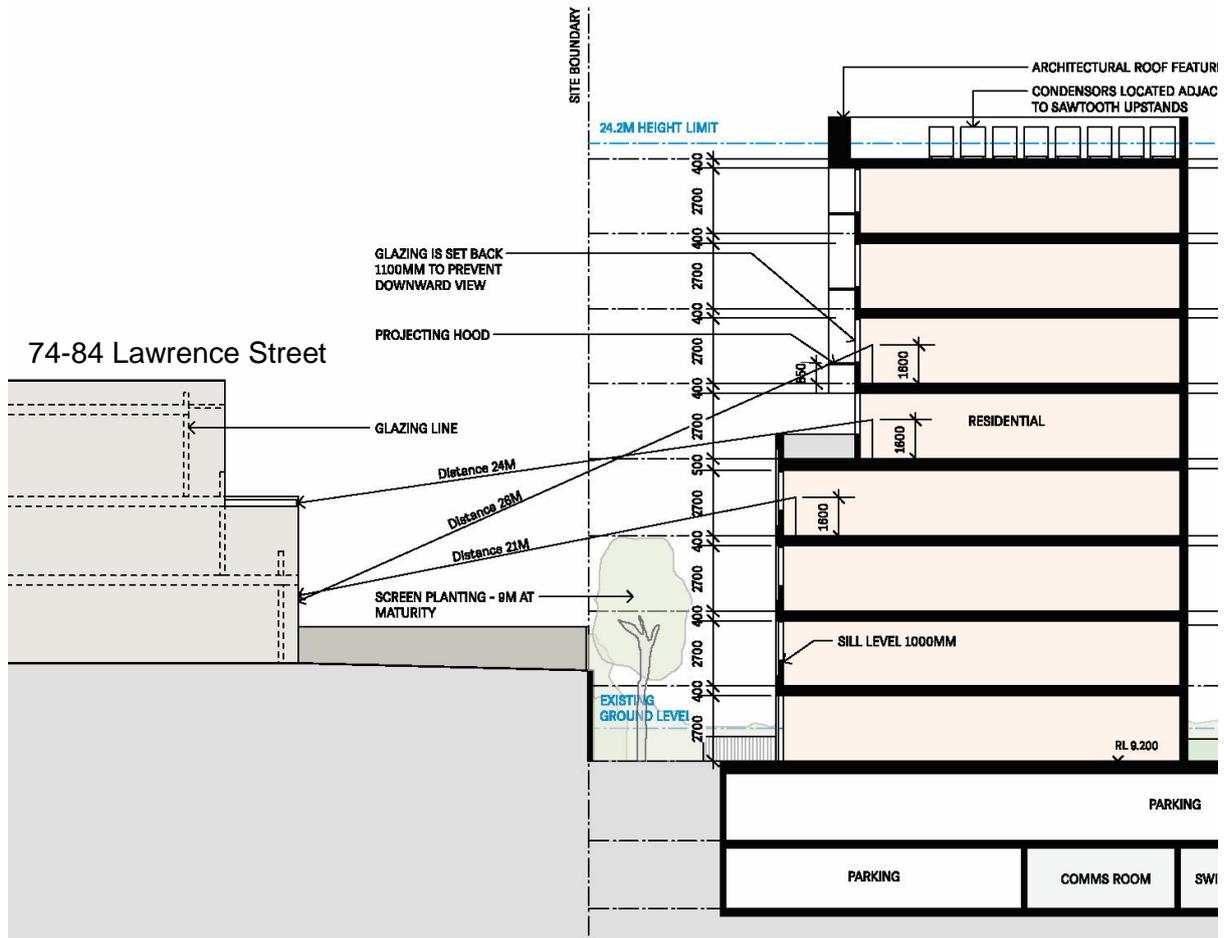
Relationship between Building A and existing terraces at 74-84 Lawrence Street
